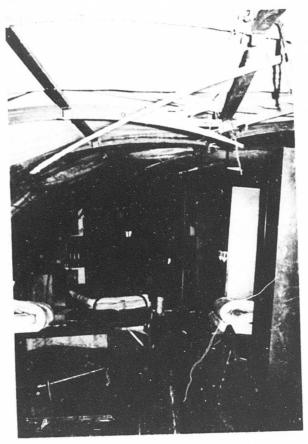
Interior view of Jamesway, Trench 10. Note floor panel being displaced by effect of trench floor arching.
